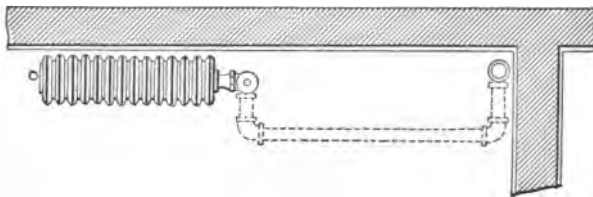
Plan, Single Pipe Radiator Connection, Branch Below Ceiling
